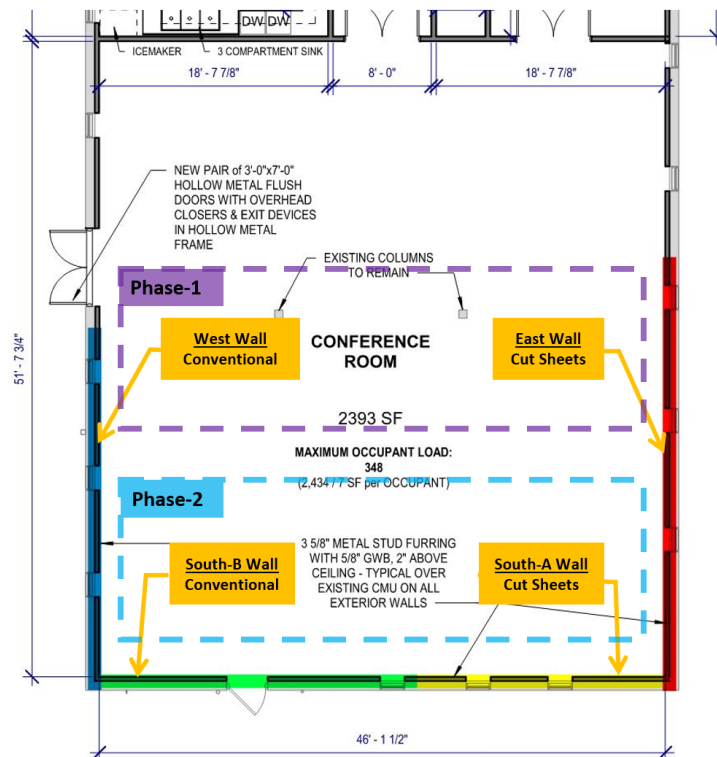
Walls in the Conference Room selected for the study, being highlighted in colors: West wall, blue; East wall, red; South-A, yellow; and South-B, green.
